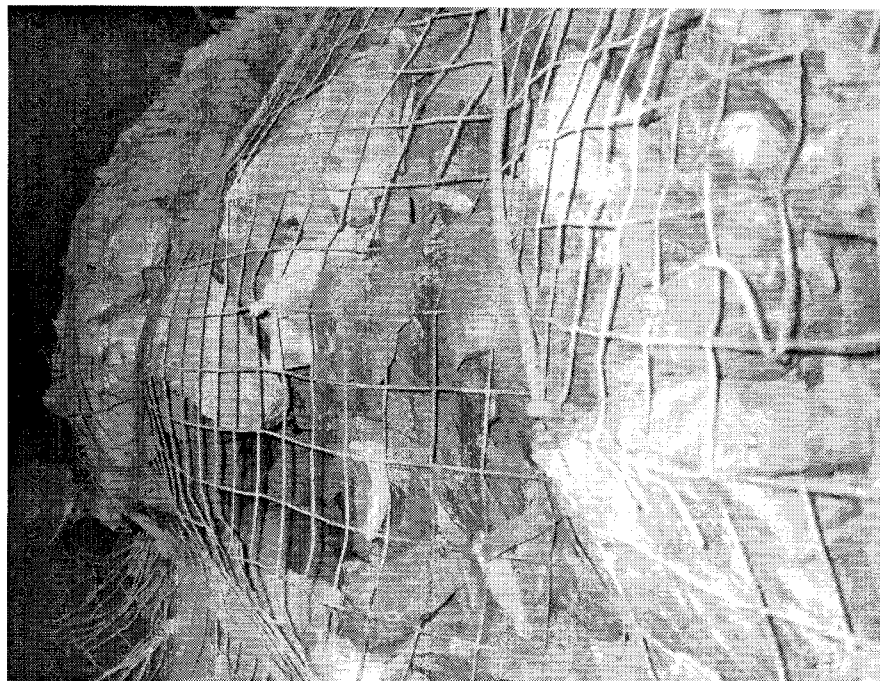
Bulking of fractured sidewall rock mass between rock bolt reinforcement and lacing within 42 level haulage.
